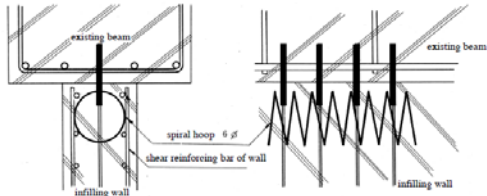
Strengthening against splitting with spiral reinforcing bars
